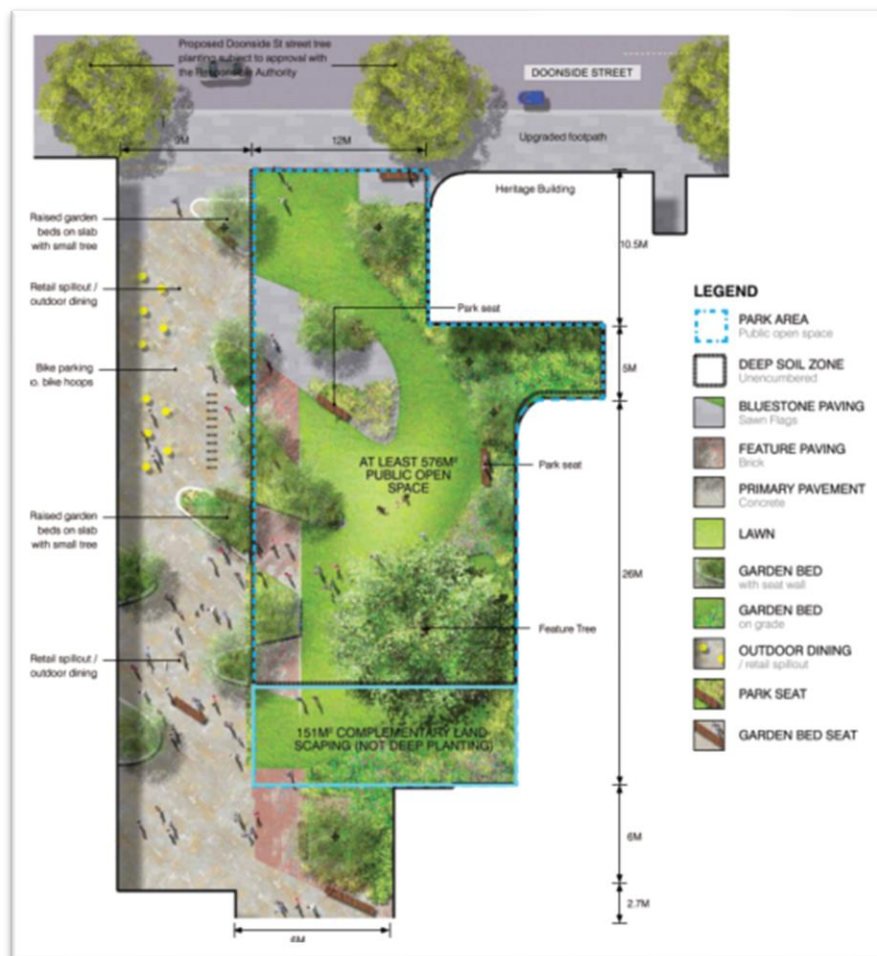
Indicative design of Doonside Park. Source: Development Plan (2023)
